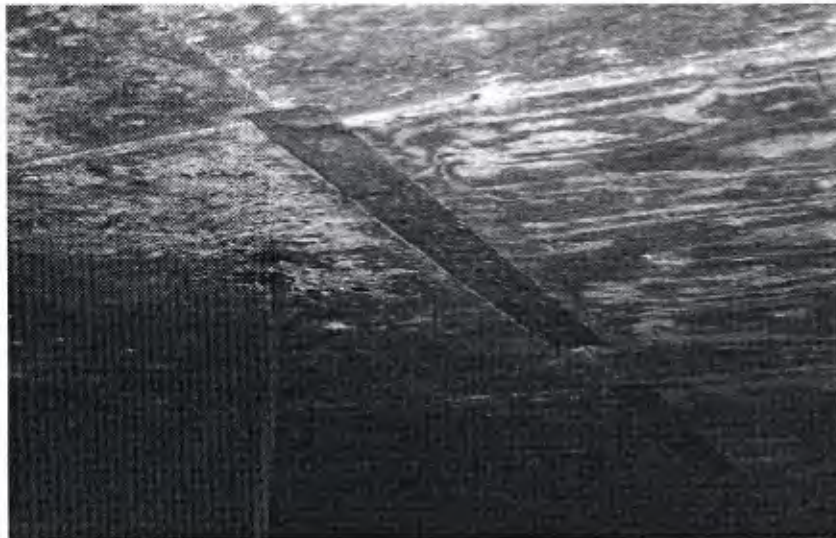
Pipe hanger and deep cut form marks in the under side of Pier 11 north lane.
